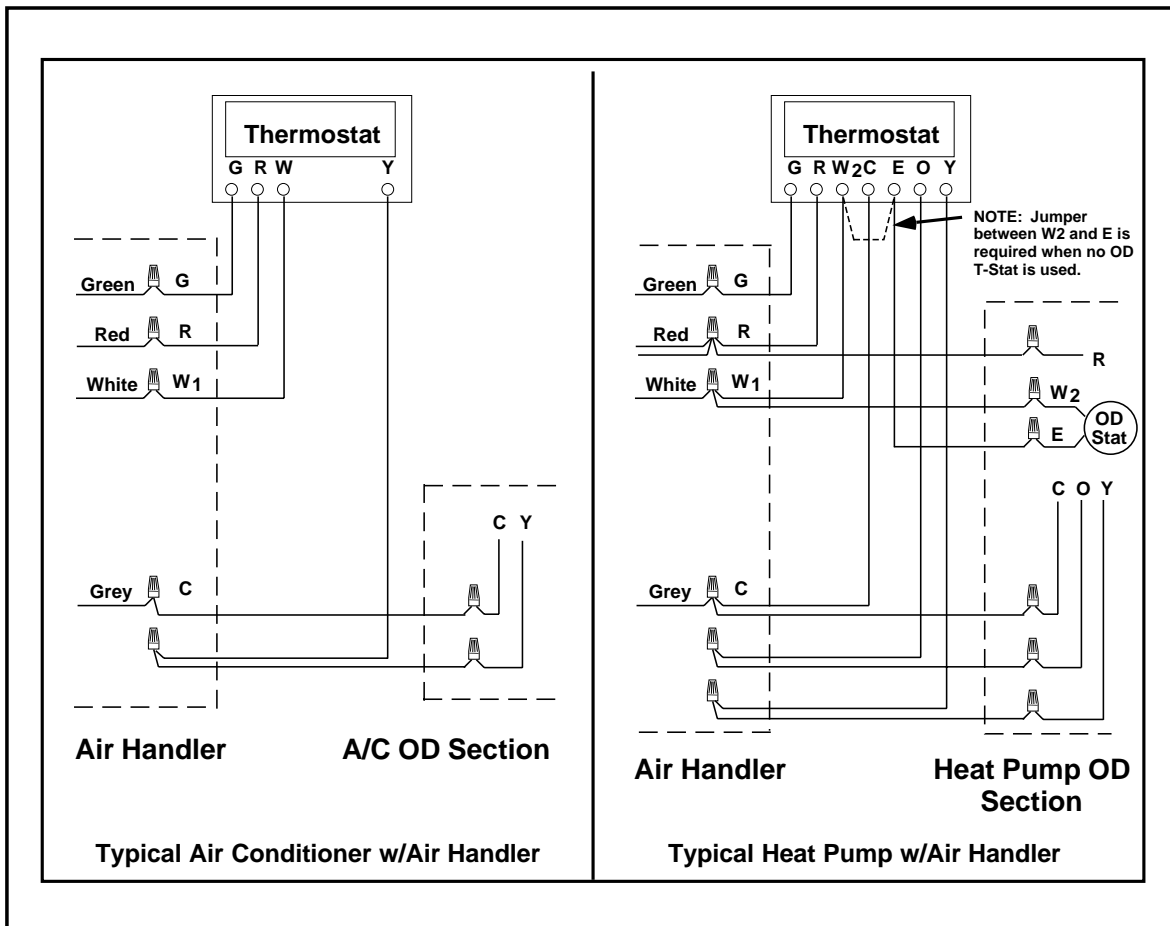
Typical Air Conditioning and Heat Pump System Connections
